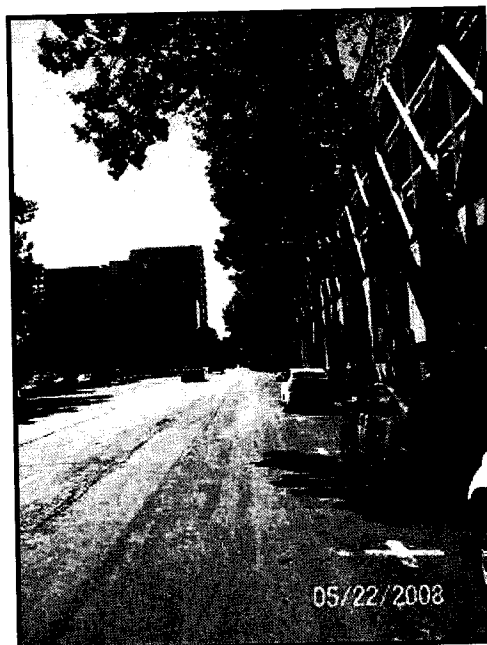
Looking South on Market Street toward the Intersection from 150 Meters
